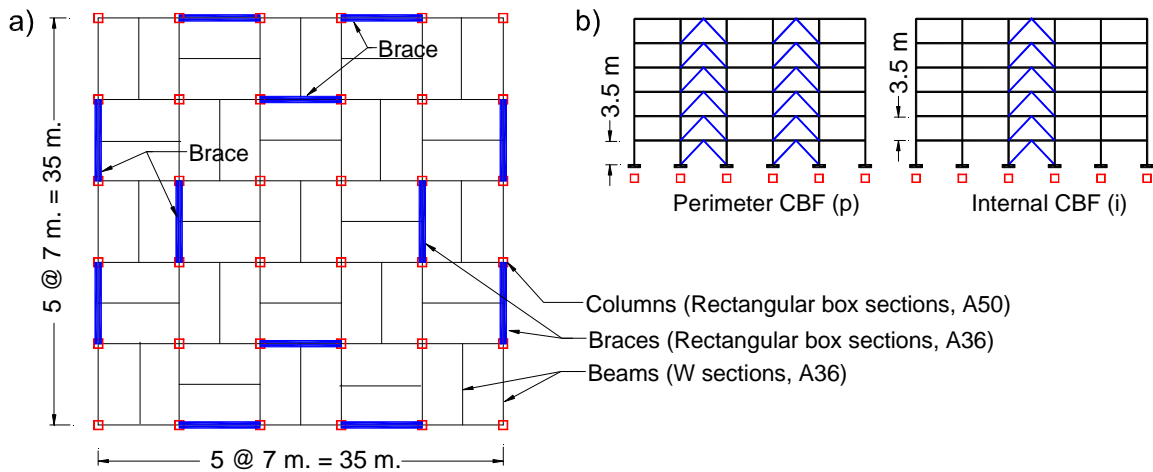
Buildings studied: a) Typical floor plan view; b) CBF elevations.
